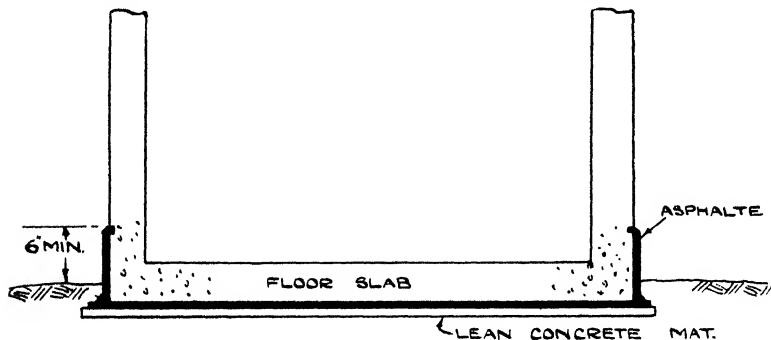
DAMP COURSING TO SMALL CONCRETE BUILDING AT GROUND LEVEL
